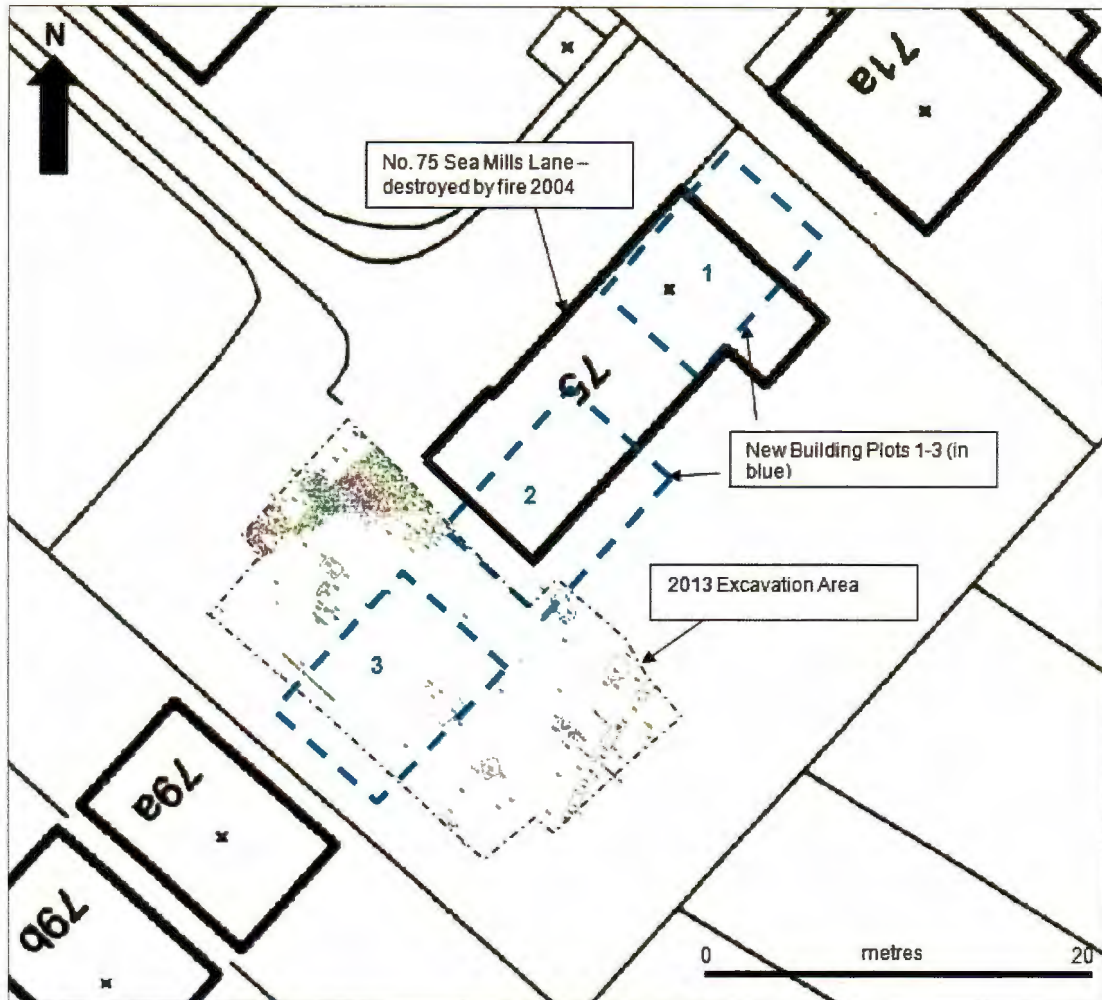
The site showing excavation area and footprint of building plots 1-3 in blue, scale as shown.
